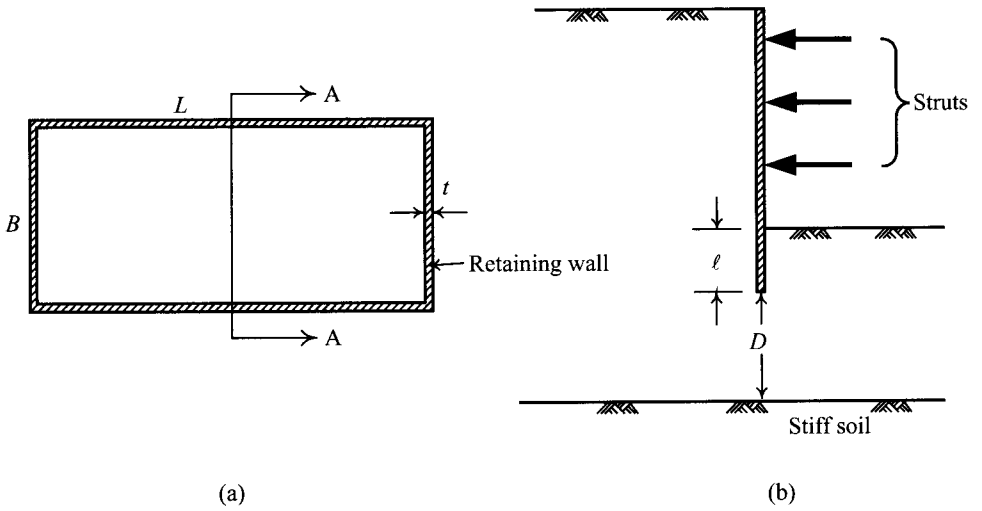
Excavation with the retaining wall  $\ell$  deep into ground: (a) plan and (b) profile at the A-A section.
